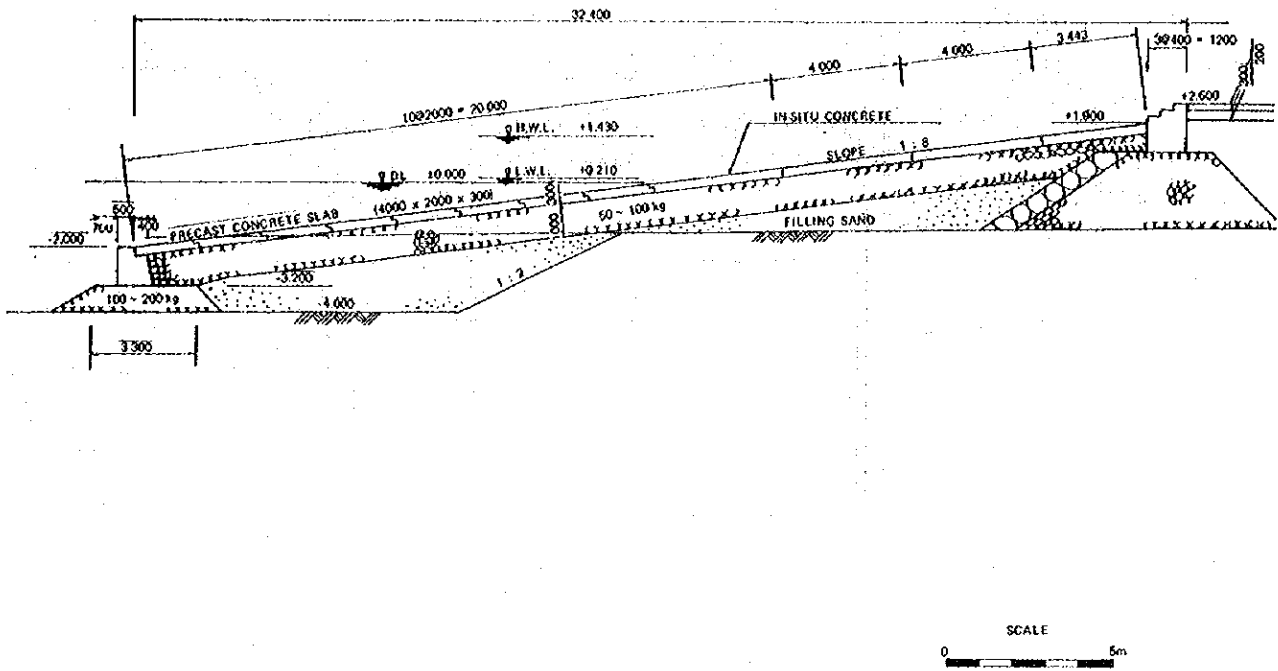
Cross Section of Stair Landing – Lucena Port
